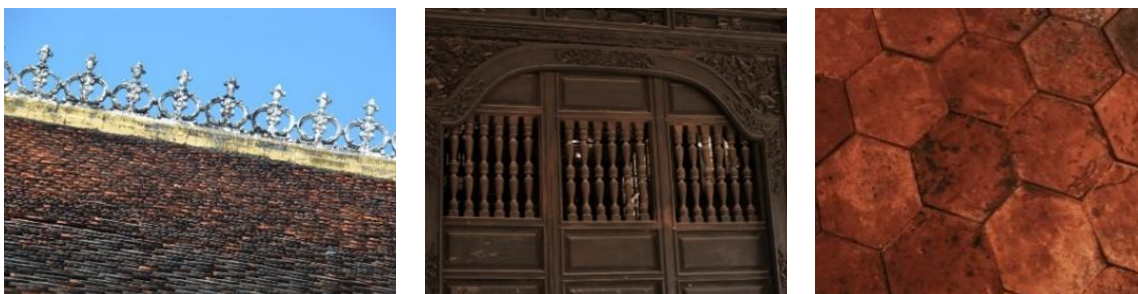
Solution to limit heat penetration using tile, wood, and brick materials in Mr. Ba Duc's house.
